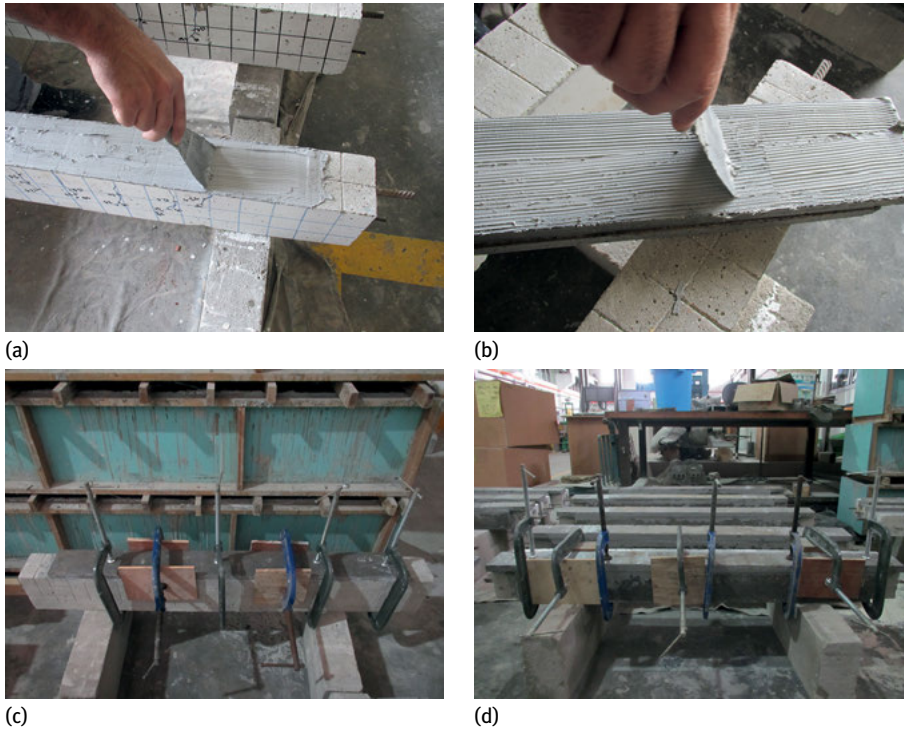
Retrofitting of damaged RC beams using GUSMRC precast strips.
